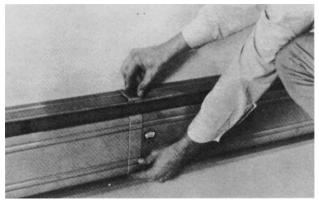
Straight-line installation. (Courtesy Vulcan Radiator Co.)
